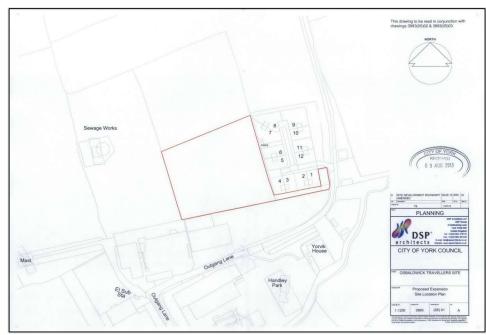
Approved site location plan (application reference 13/02704/GRG3)
